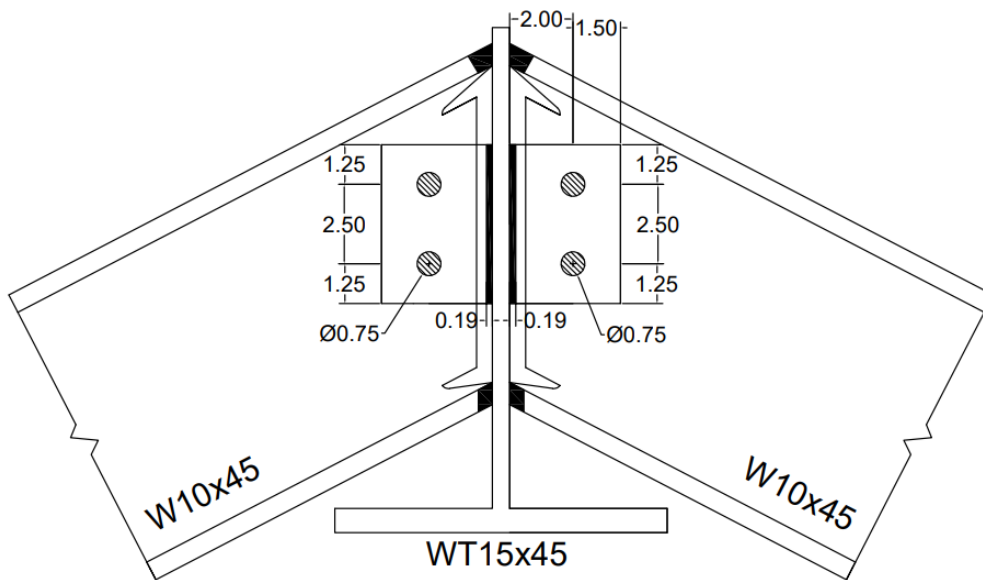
Moment connection of roof beam to ridge beam in the north section.
